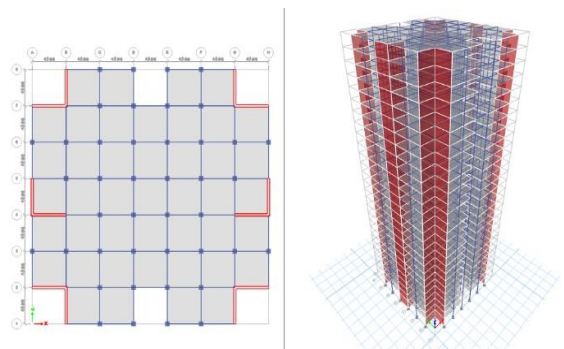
Plan of Structure L- Shape shear Wall (Model 5)
